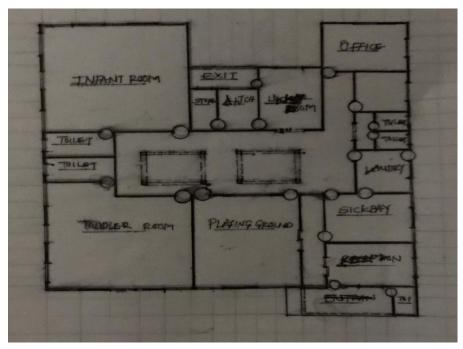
SHOWING THE PROPOSED DAYCARE FLOOR PLAN
